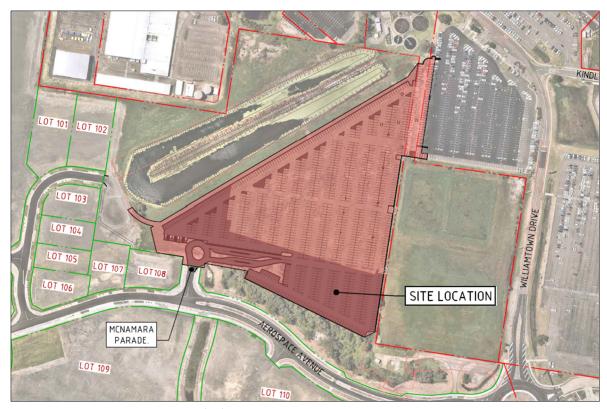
Site Plan. Source: Northrop (20/10/2022)
